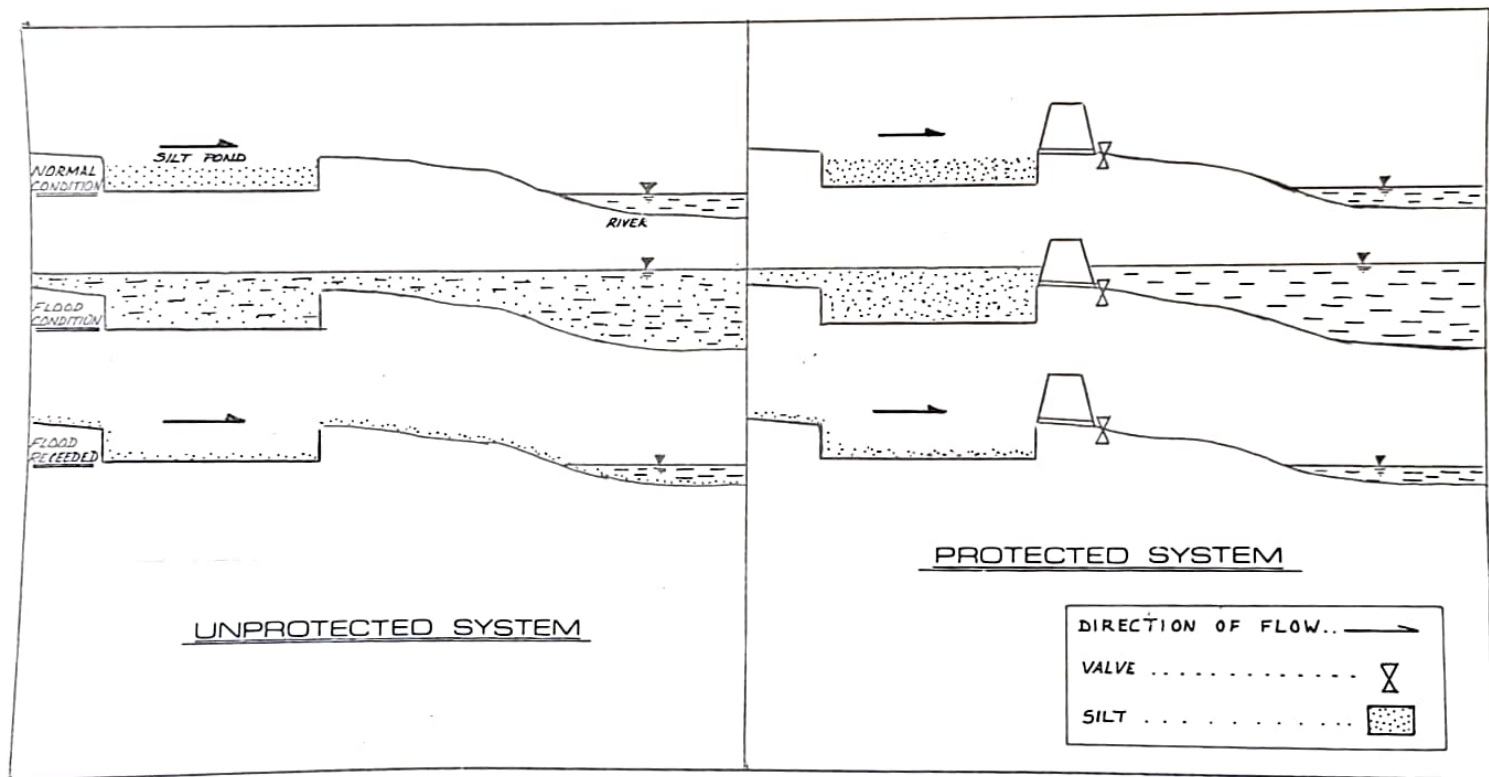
PROVISION OF WALLS IN SILT PONDS
